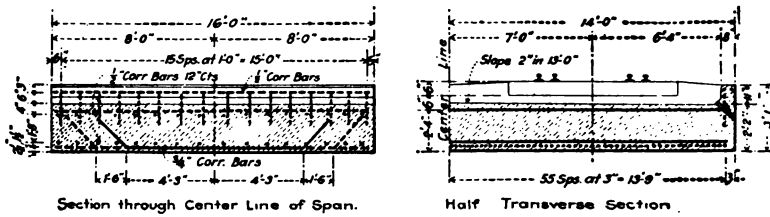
Details of Floor, Cave Hollow Bridge.
